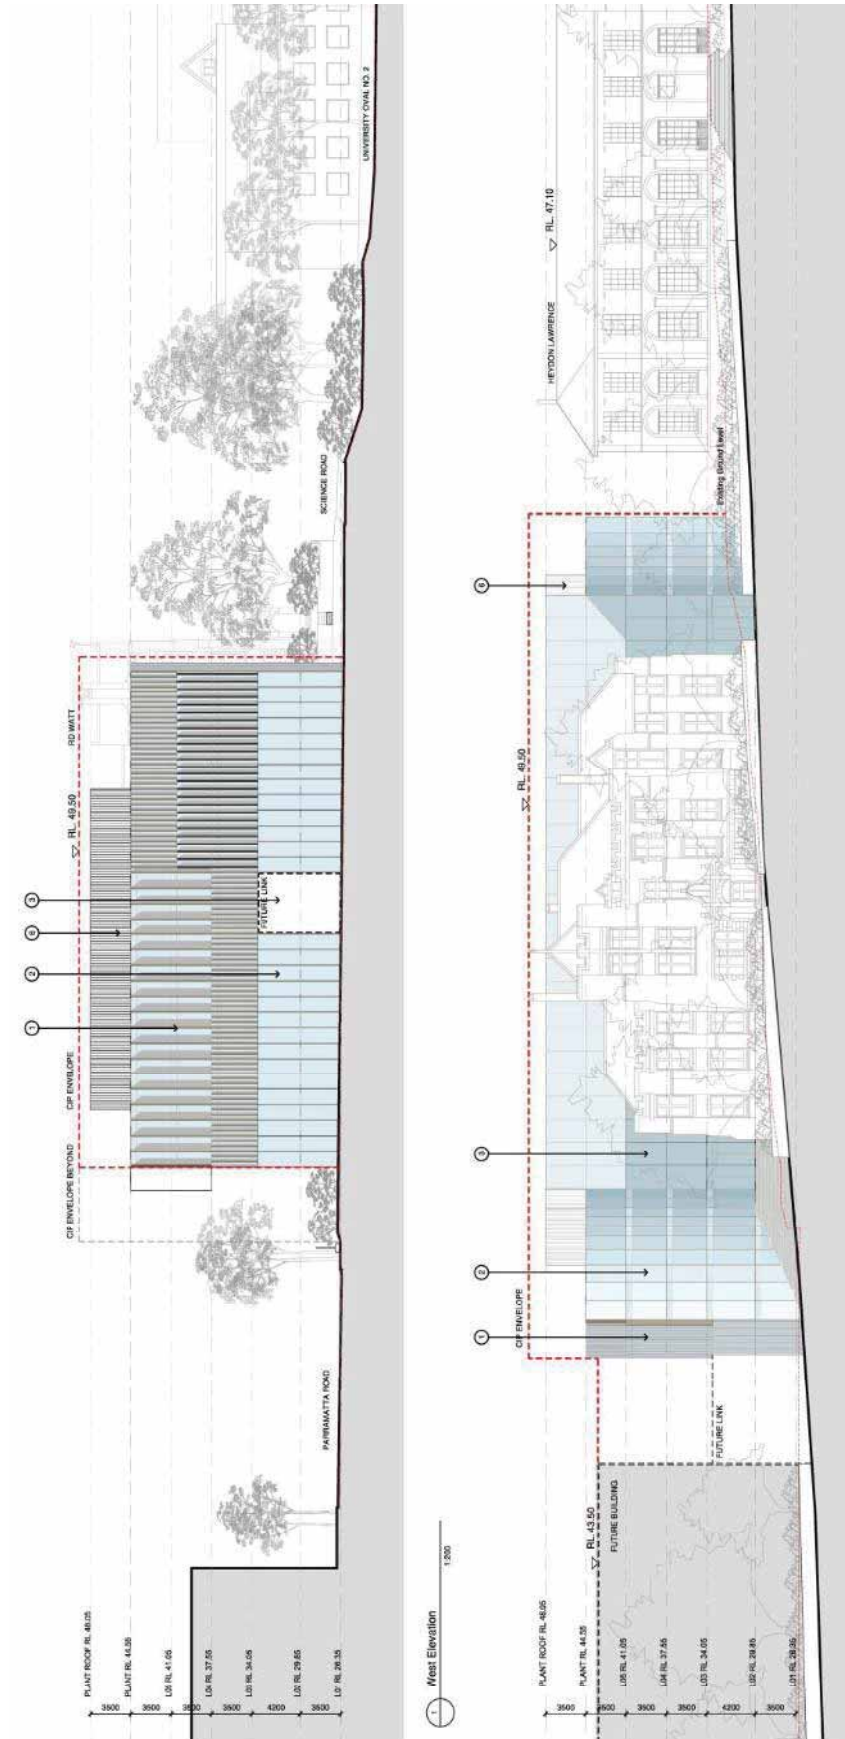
Proposed west and south elevations for FASS building (A02). (Source: BatesSmart Architects Pty Ltd 2015)
